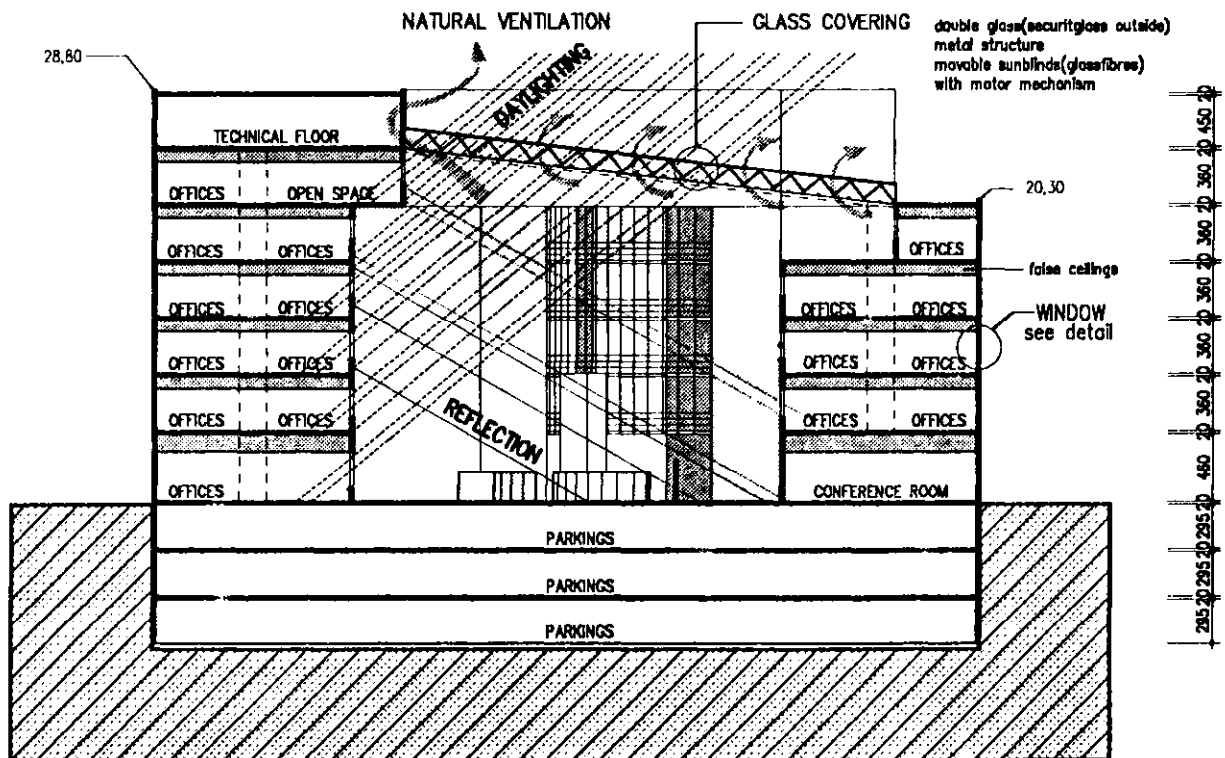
CEC THERMIE Project : 12,500 m² office building in Brussels - Section.
